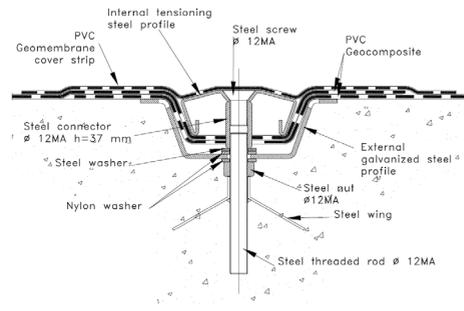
Embedded tensioning profile at Miel I RCC Dam.
